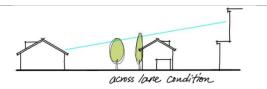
If a proposed building would be taller than adjacent development, upper floors should step back to provide transition in scale.
